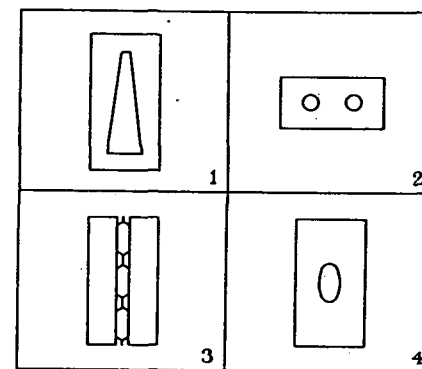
SECTIONS THROUGH TYPICAL HEATING UNITS OF EXTENDED SURFACE TYPE
